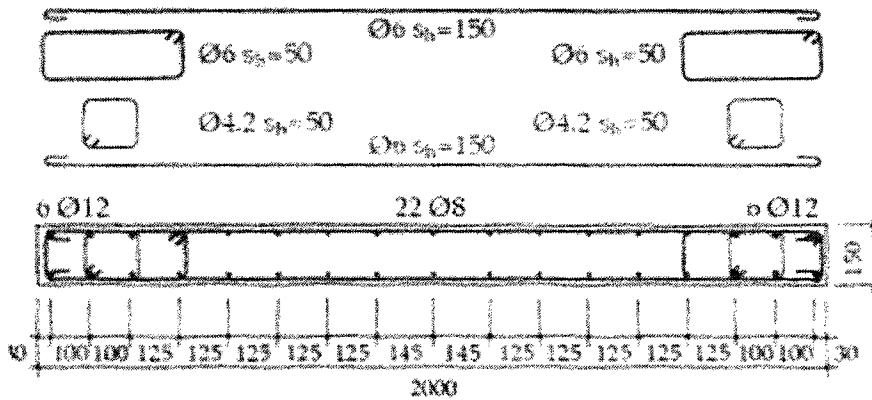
Reinforcement details of WSH6 (after Dazio et al., 1999)
